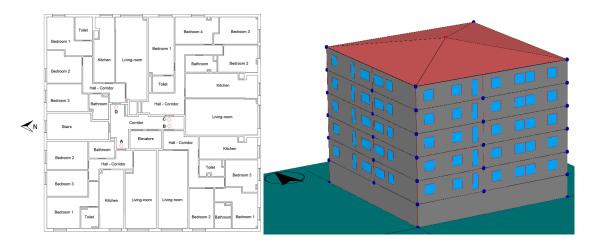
Floor plan of the four types of dwellings and a 3D view of the studied building.
